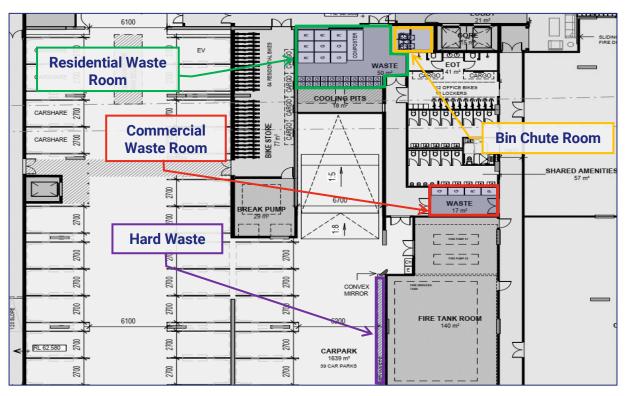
Proposed Waste Area at Ground Level - North Building and Commercial
